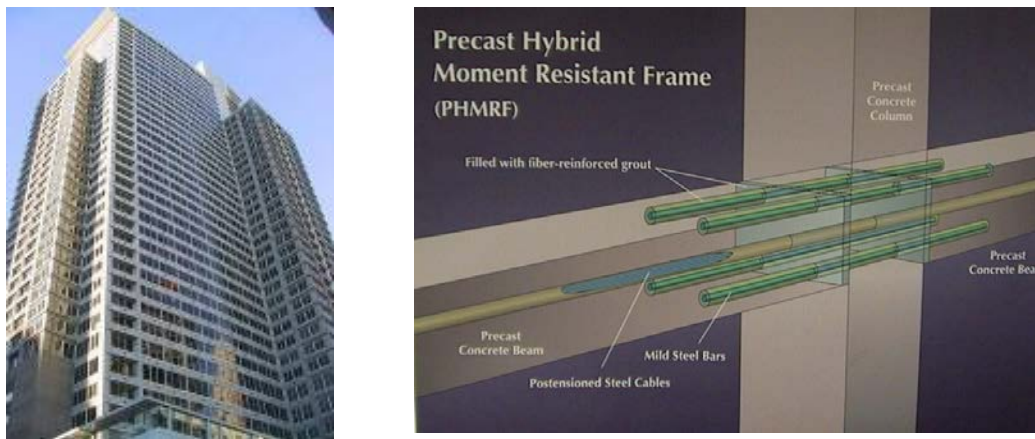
Paramount Building, 39-storey building, San Francisco (Englerkirk, 2002, photos courtesy of Pankow Builders, E. Miranda, Len McSaveney).
